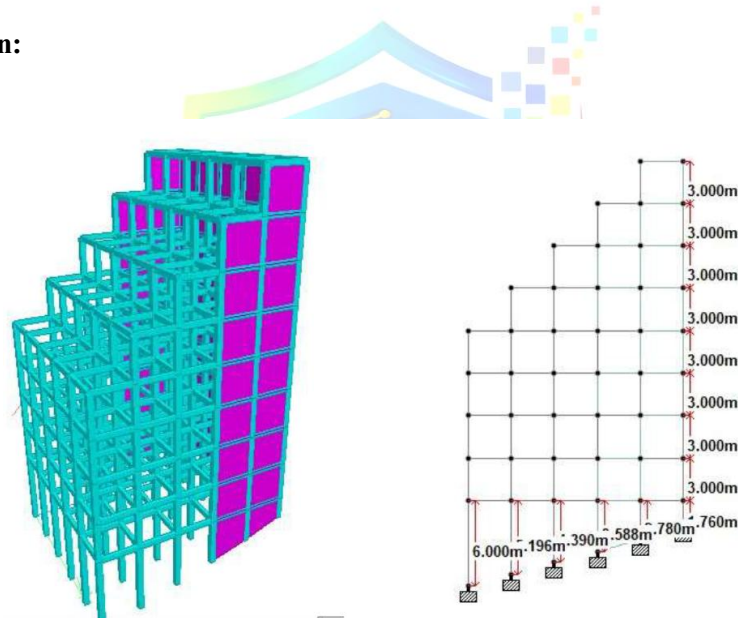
Elevation of C Shape Shear Wall with 15° Slope
